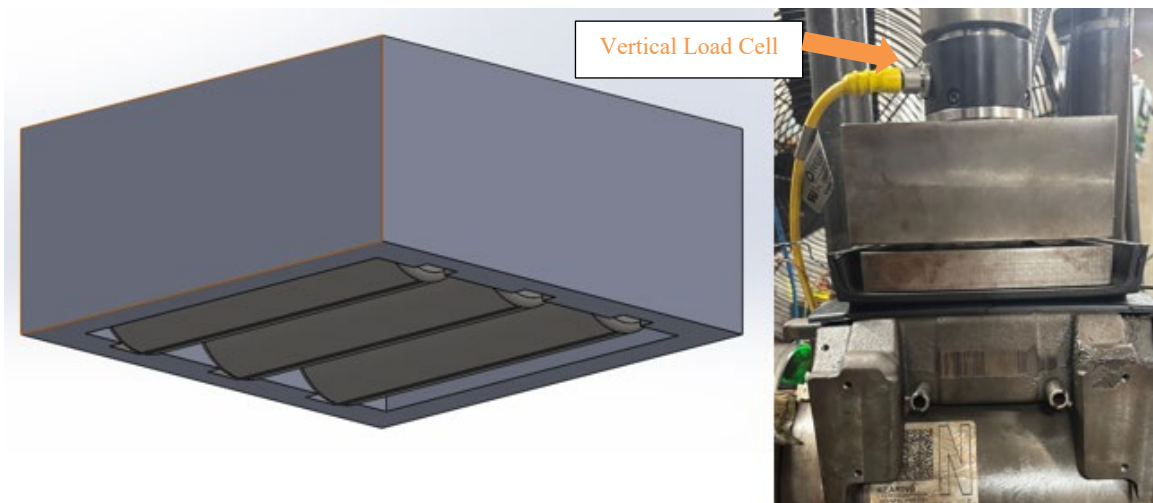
(left) CAD figure of the linear bearing assembly and (right) linear bearing assembly and vertical load cell on laboratory tester setup
